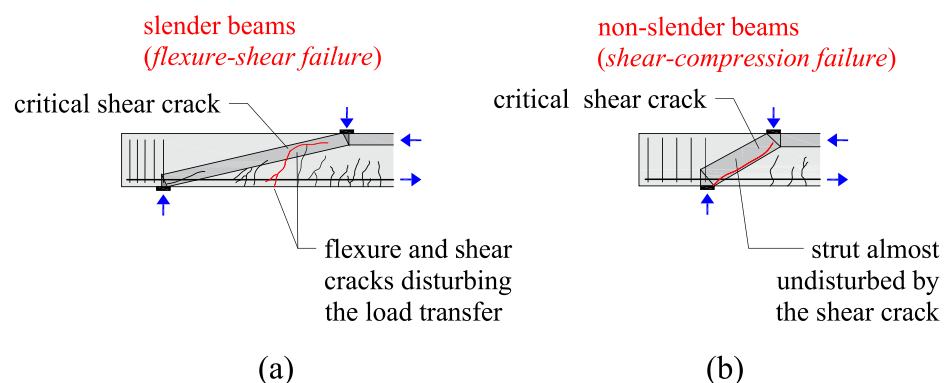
Influence of the shear slenderness (here defined as a_v/d_l) in the cracking pattern and failure mechanism of members loaded over the entire width: (a) slender beams failing in flexure-shear; (b) non-slender beams failing in shear-compression (adapted from Muttoni and Fernandez Ruiz [17]).
